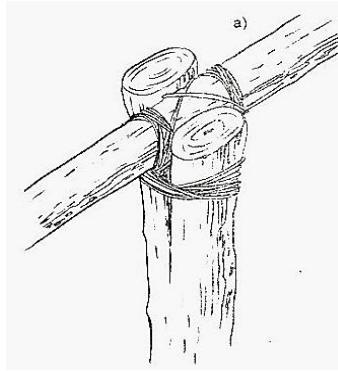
The twin-pile building technique: a) long piles supporting the roof (Drawings: Olenka Dmytryk) (Menotti 2012: 137, figure 4.7).
